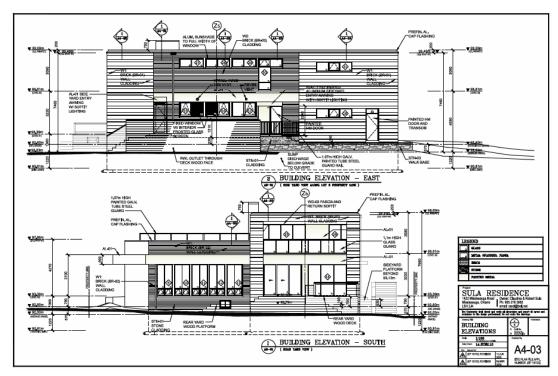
Proposed residence at 1422 Mississauga Road, east and south elevations. (Image provided by the property owner.)
